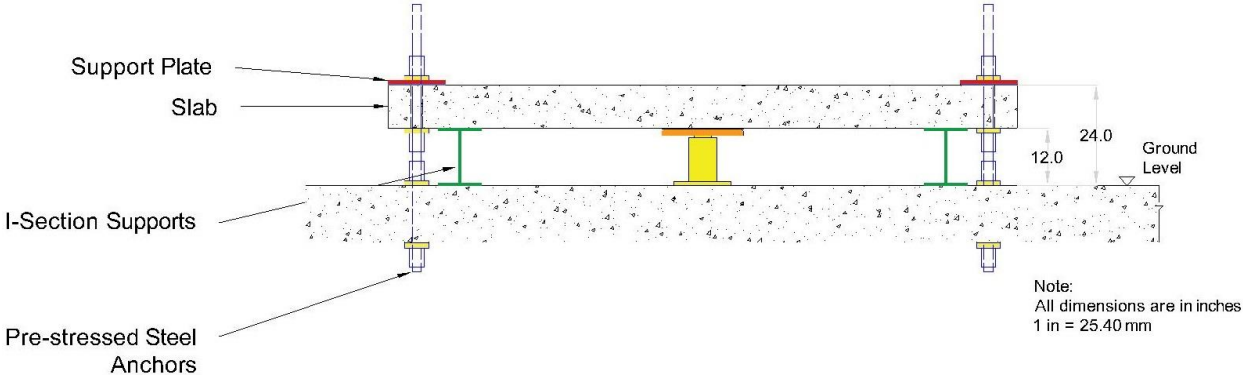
Test Setup for Sandwich Slab Specimen A
